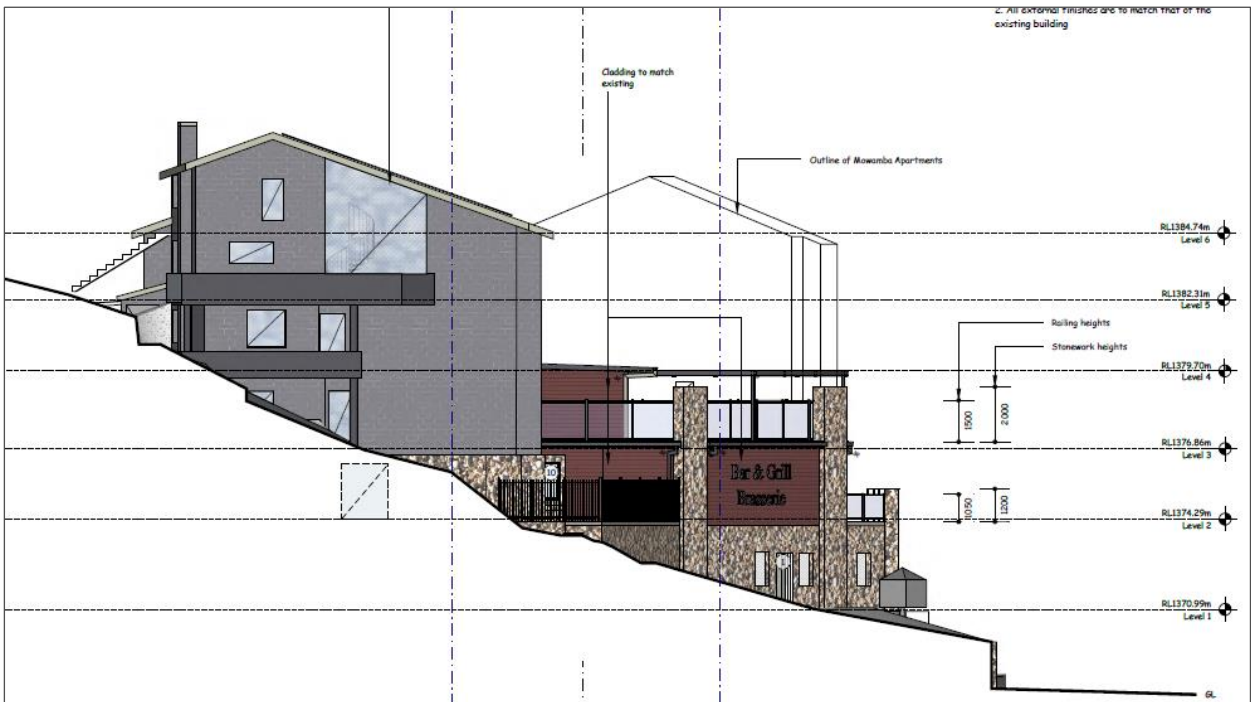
| East elevation with Mowamba Apartments in the background (Source: Applicant's documentation)
